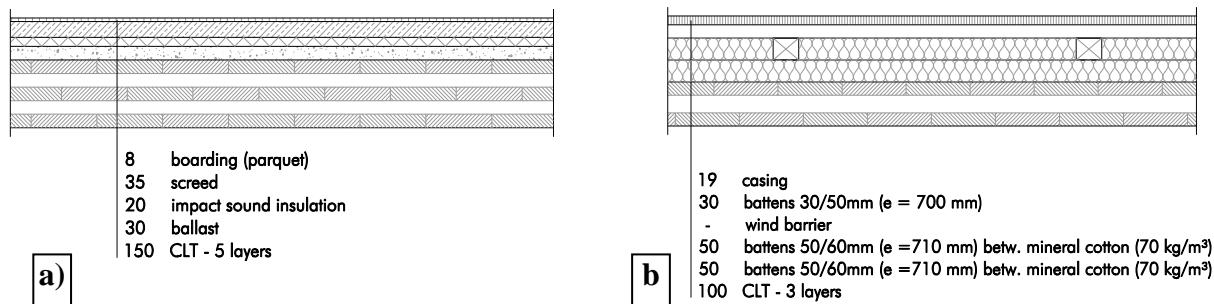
Fictitious structures: a) floor structure; b) wall structure
